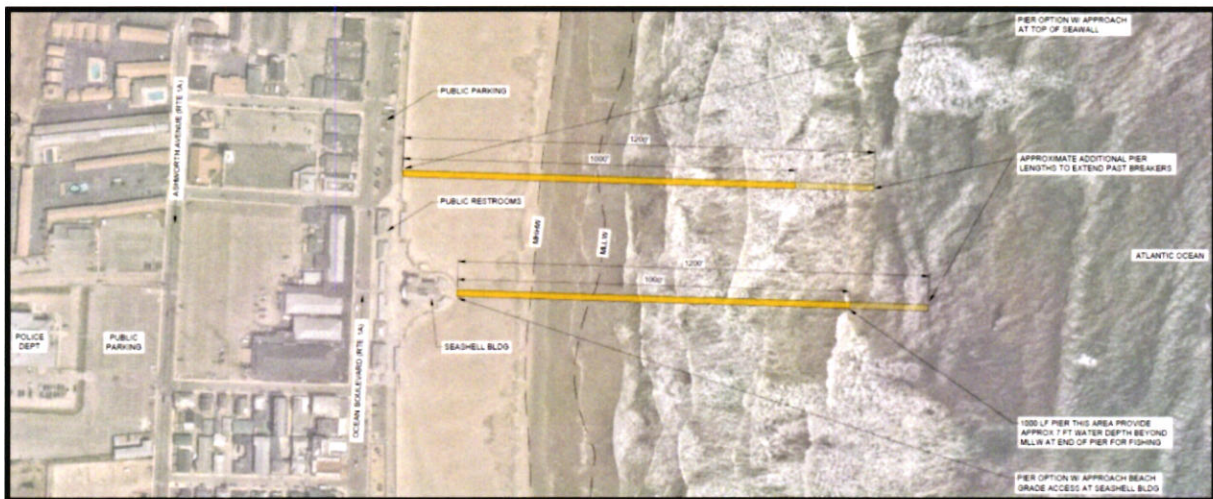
Portion of Area 2 (Middle) Proposed Pier Location Options Concept Plan
